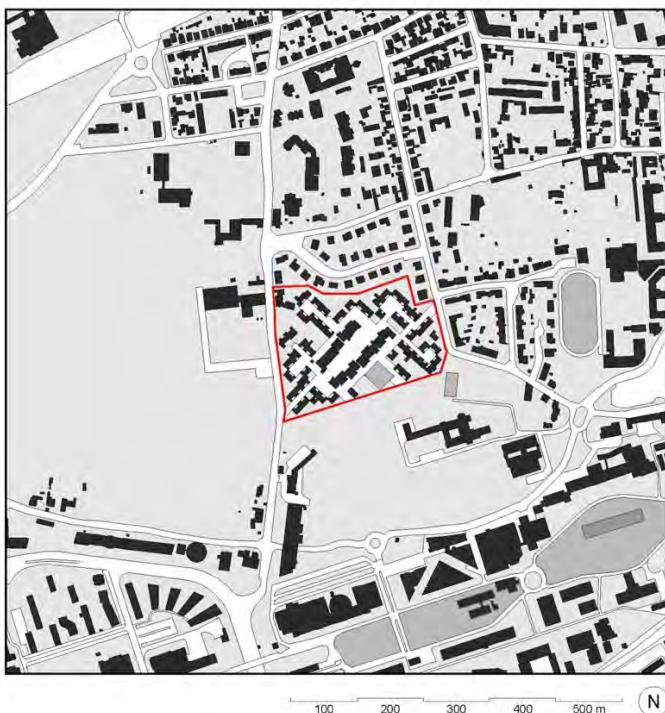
Hameau de Noailles. Situation plan. Source: (Author, 2017)
